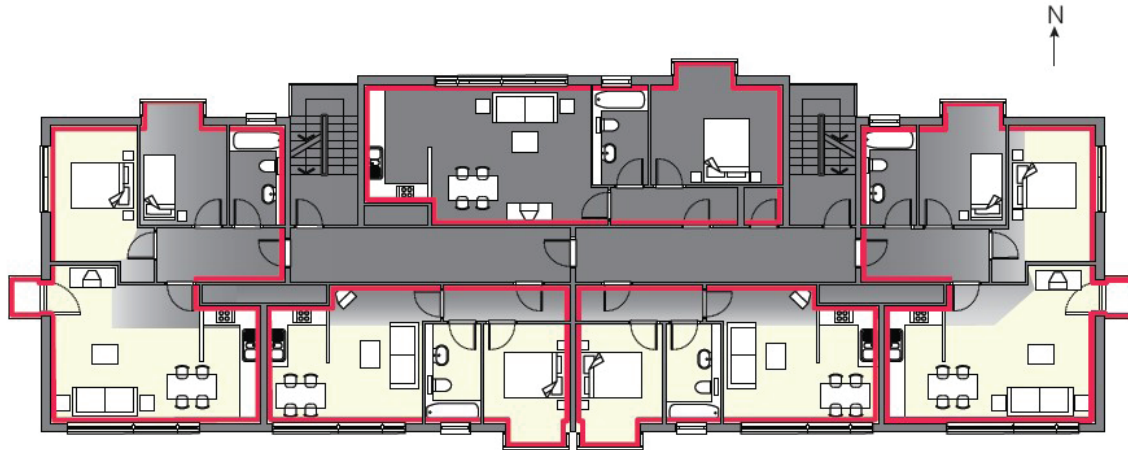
Careful layout design means that four out of the five flats shown have a south-facing living room
